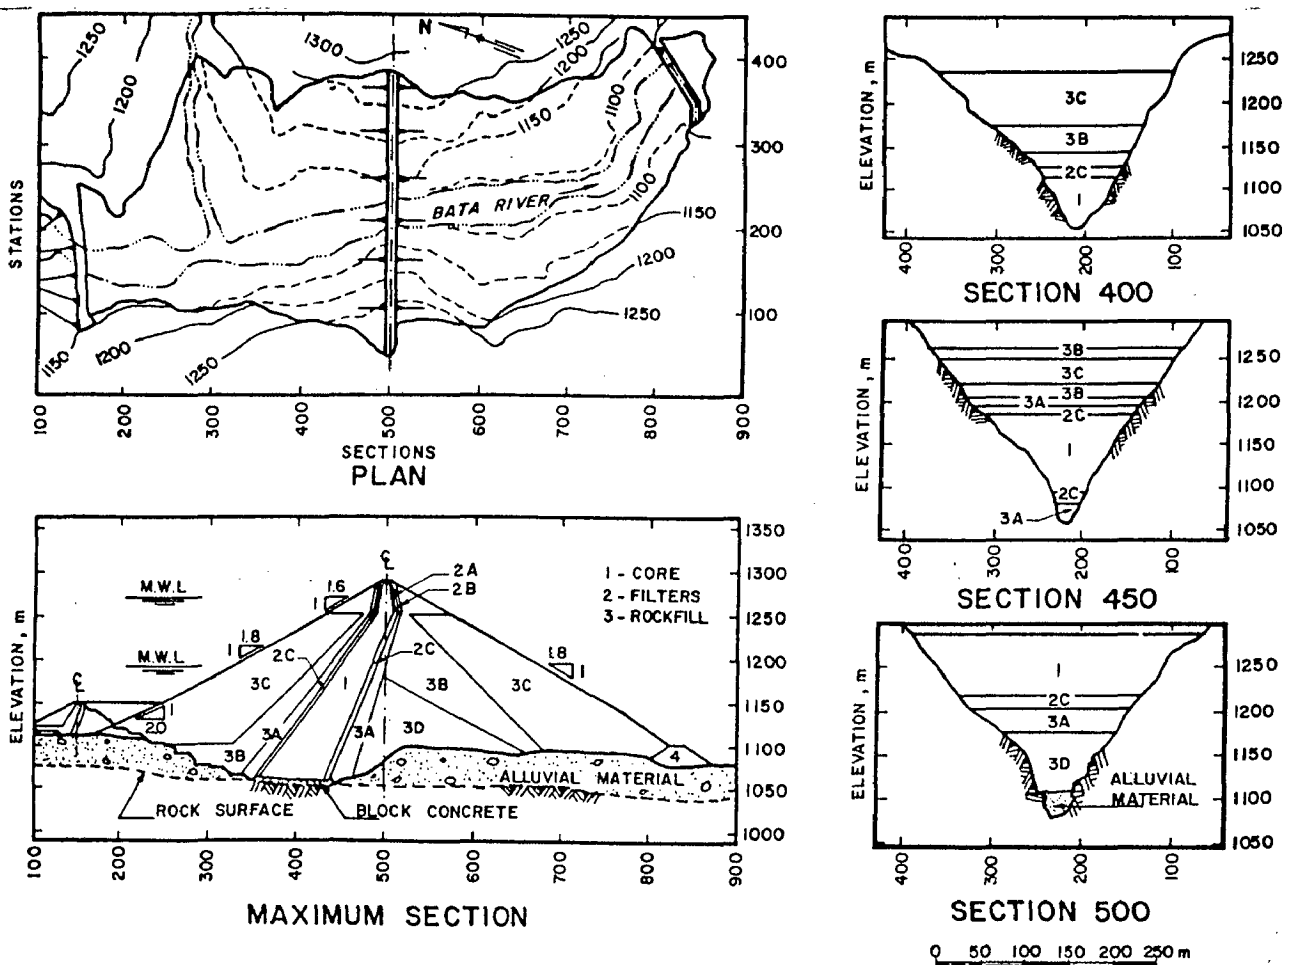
Chivor Dam – Plan and Sections (in Colombia).
